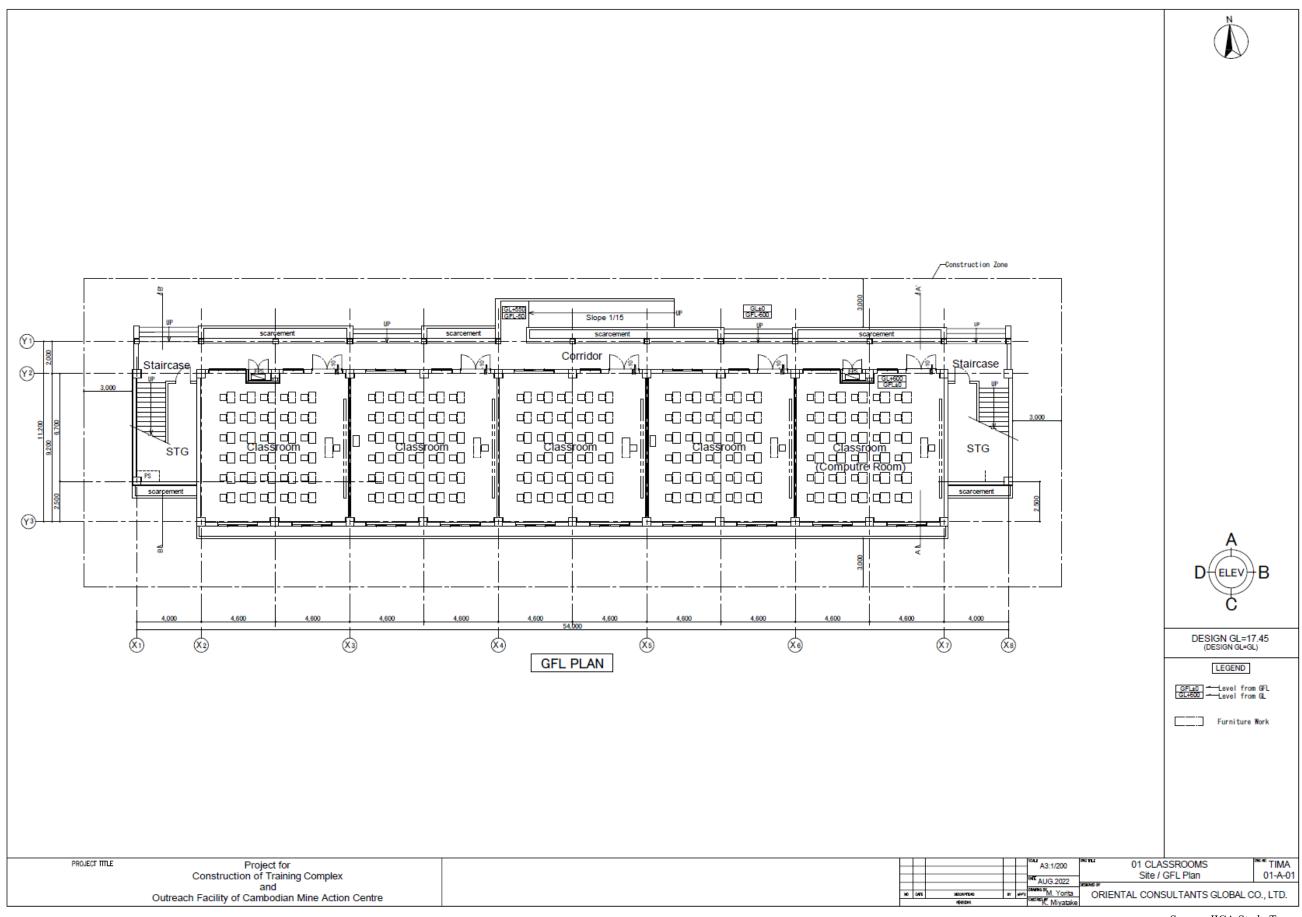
Floor Plan of TIMA Classroom Building (GFL)
